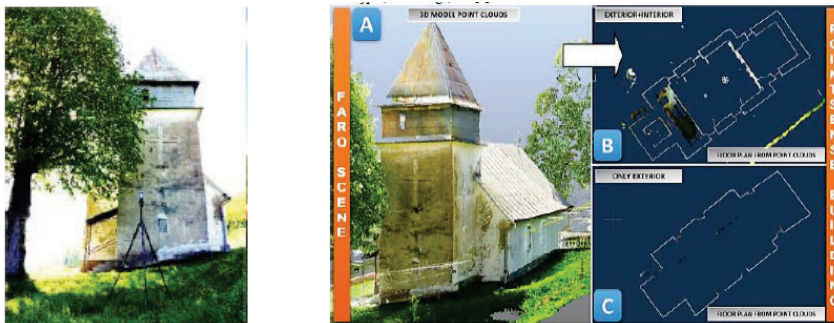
Nativity of the Blessed Virgin Mary Greek Catholic Church- Hačava. a) 3D model point clouds, b) floor plan (exterior & interior), c) floor plan (only exterior)
